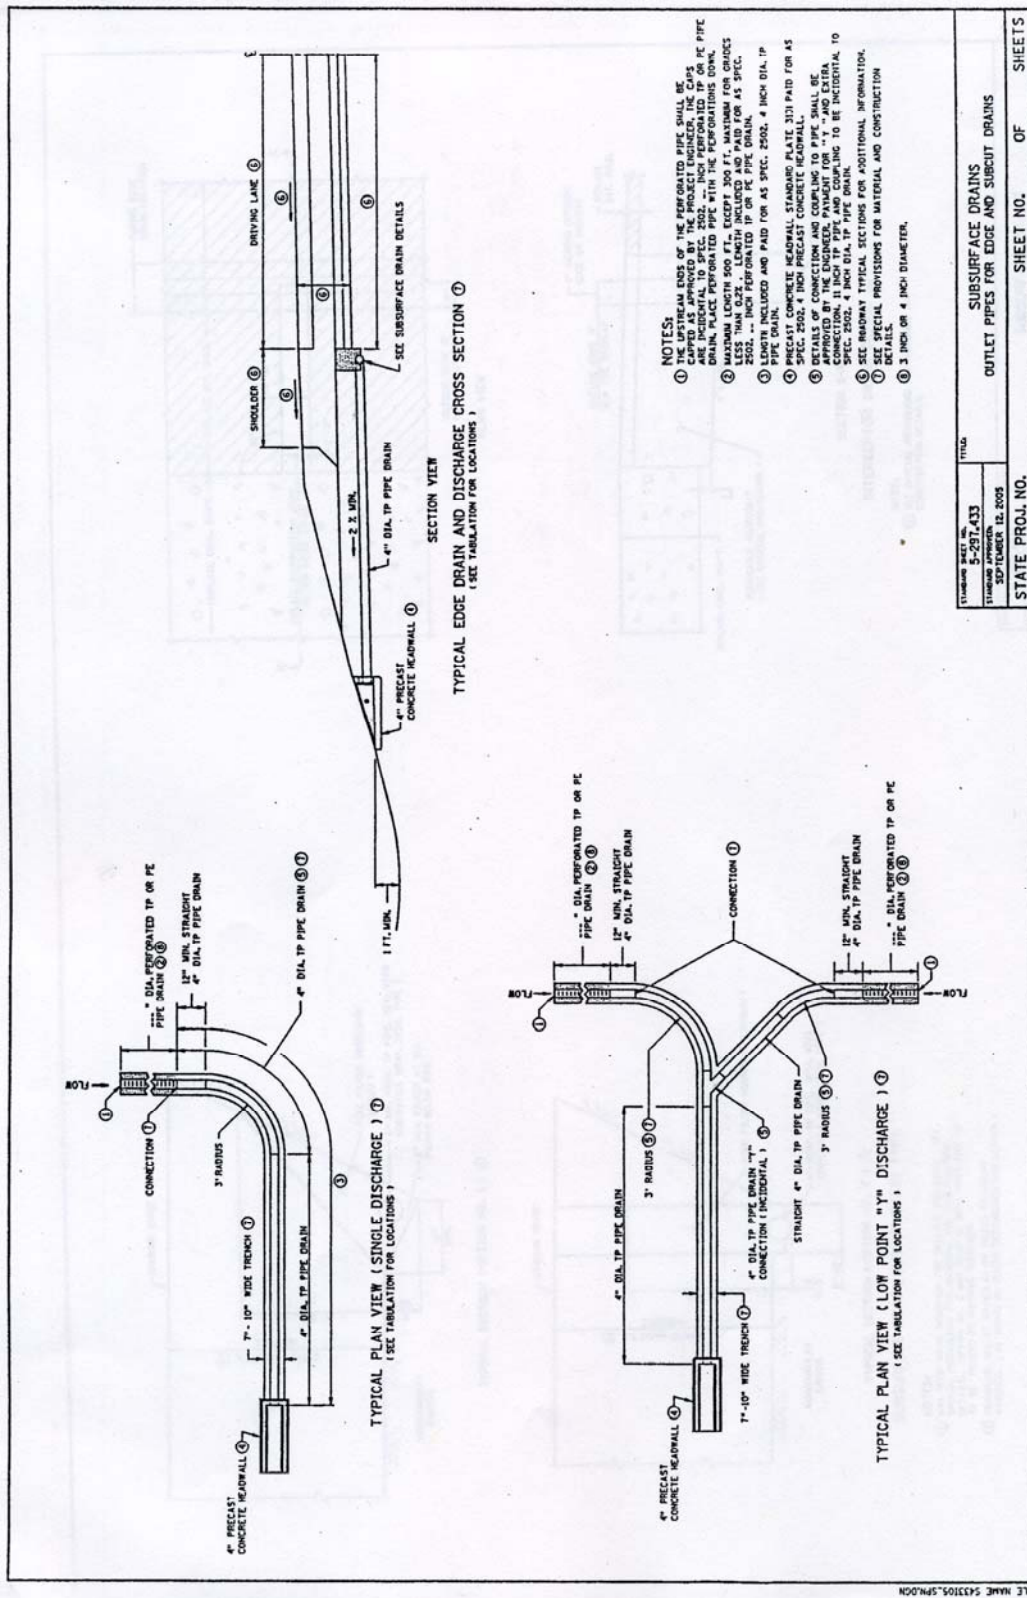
Typical edgedrain and discharge plan (Mn/DOT, 1994b).
